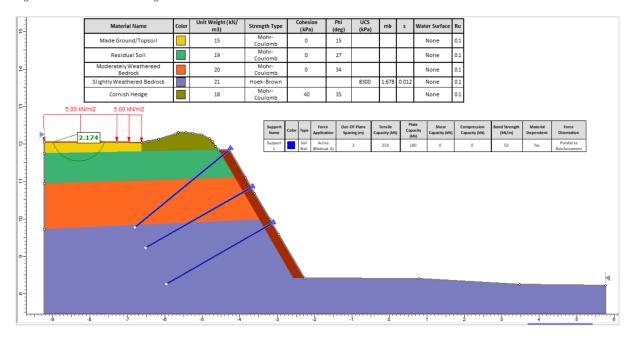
Section 1 – Facing Installation - BS8006 Set2
